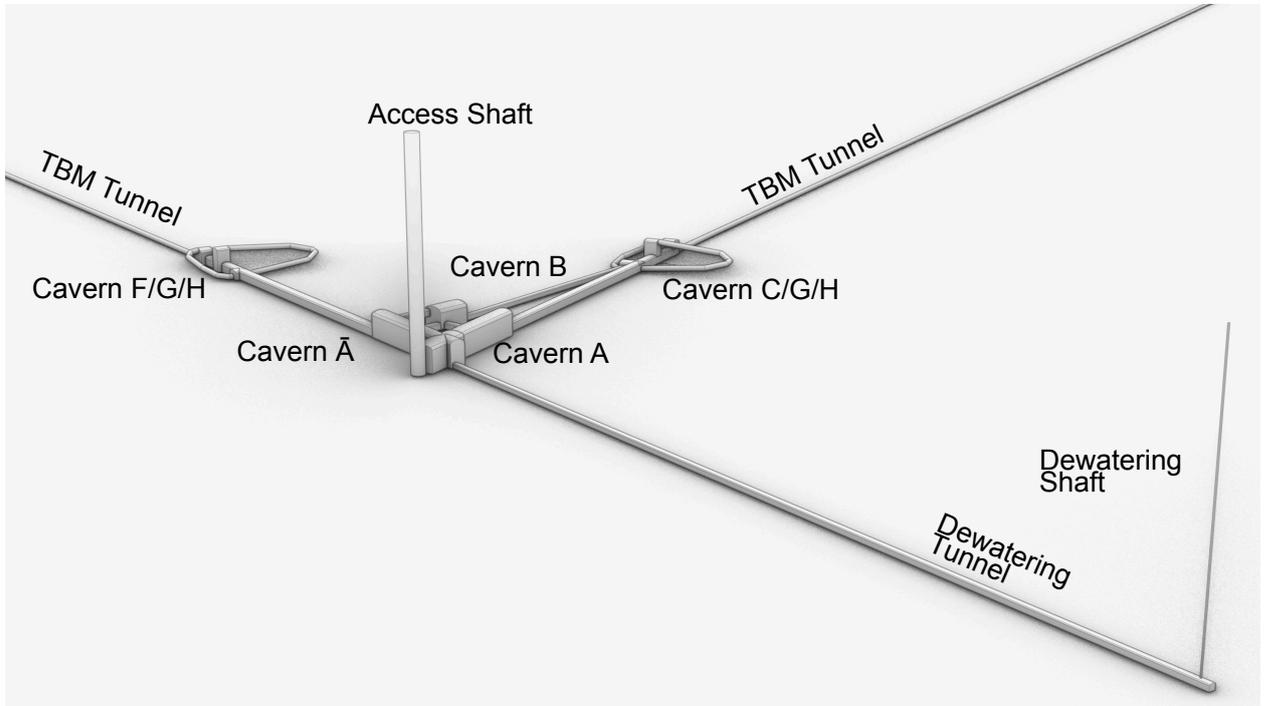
Perspective view of the underground structure at the intersection point with an inclined access tunnel
